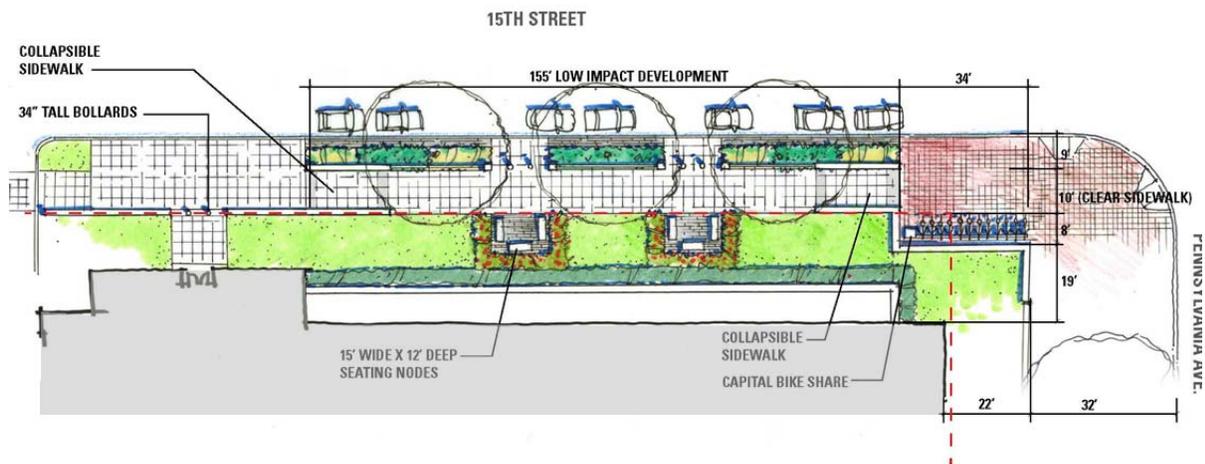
Detailed Site Plan - Corner of 15th Street, NW and Pennsylvania Avenue.
